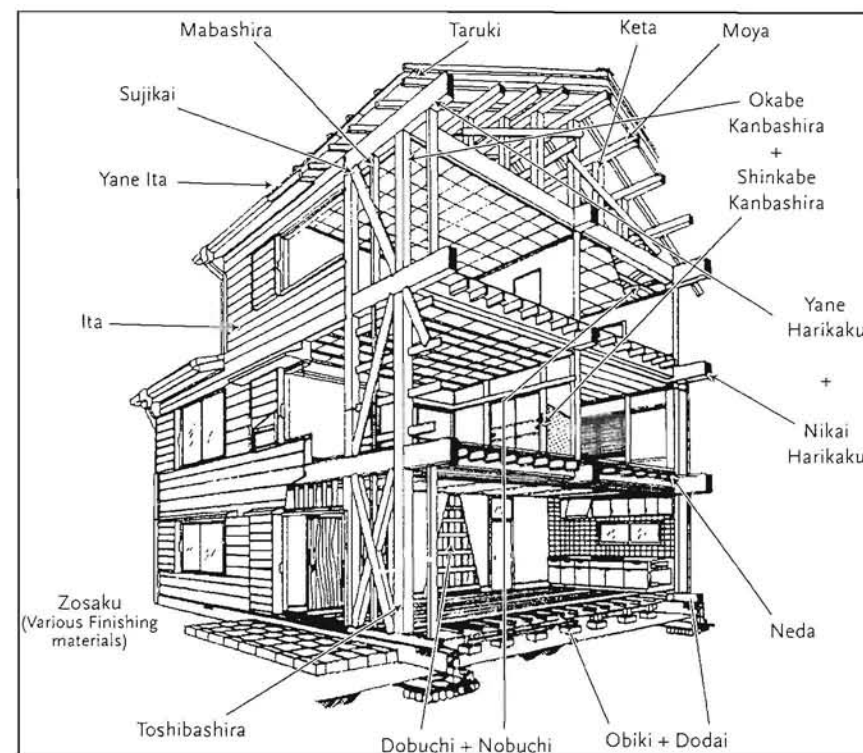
Japanese Post-and-Beam House Construction, Showing Main Structural Components
